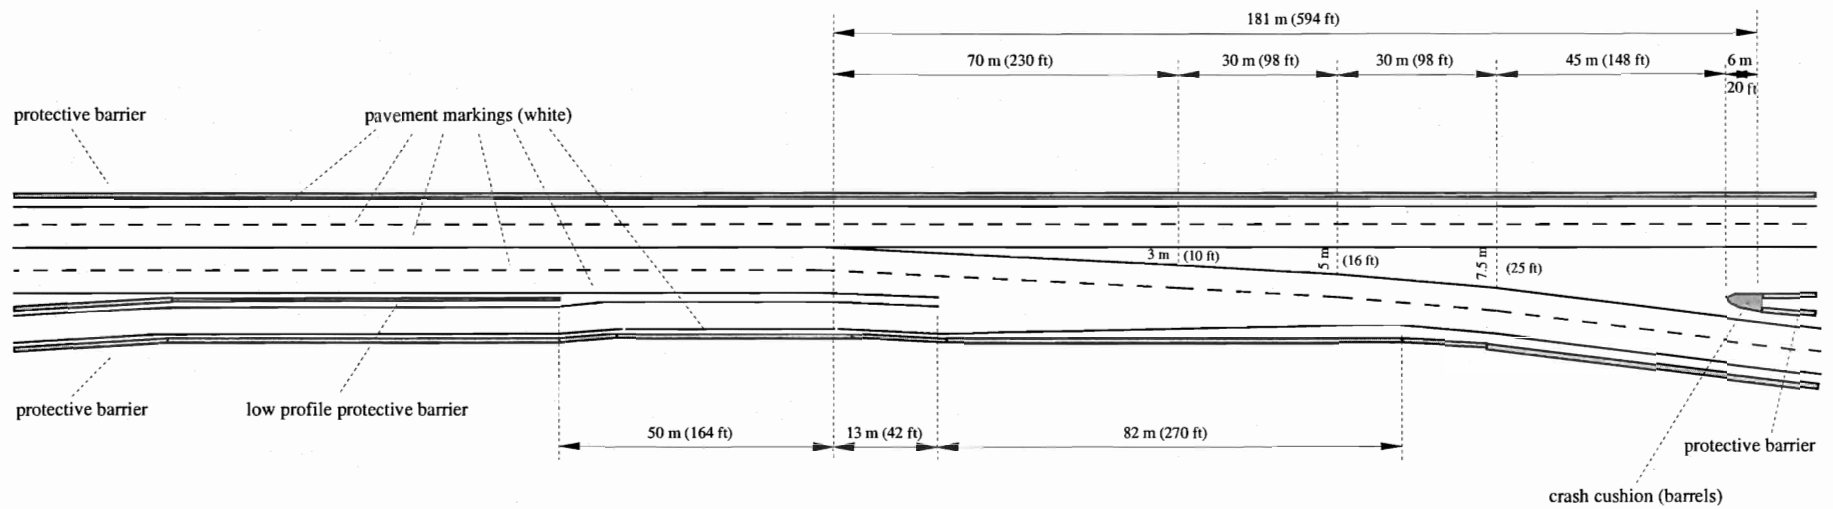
Proposed traffic control plan at intersection of Pearl Street and Woodall Rodgers Freeway.
